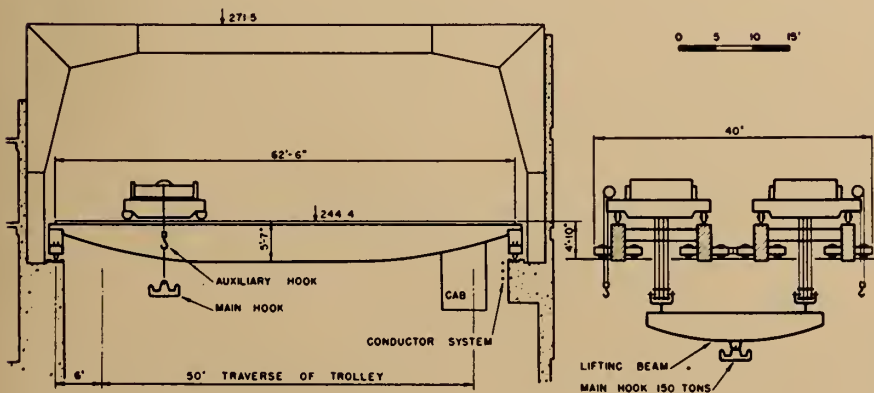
Canadian powerhouse, 80-ton erection bay cranes.
